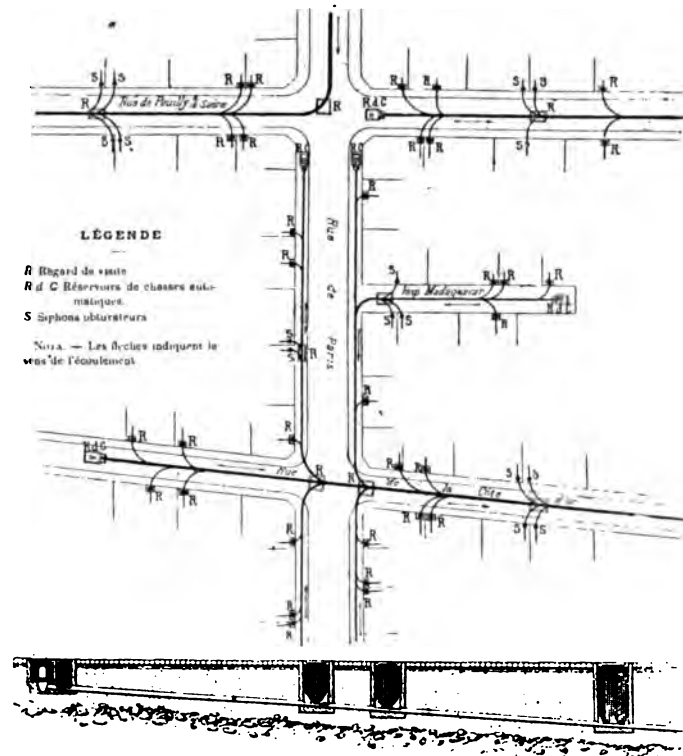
Plan of a System of Stoneware Drain-pipes.
